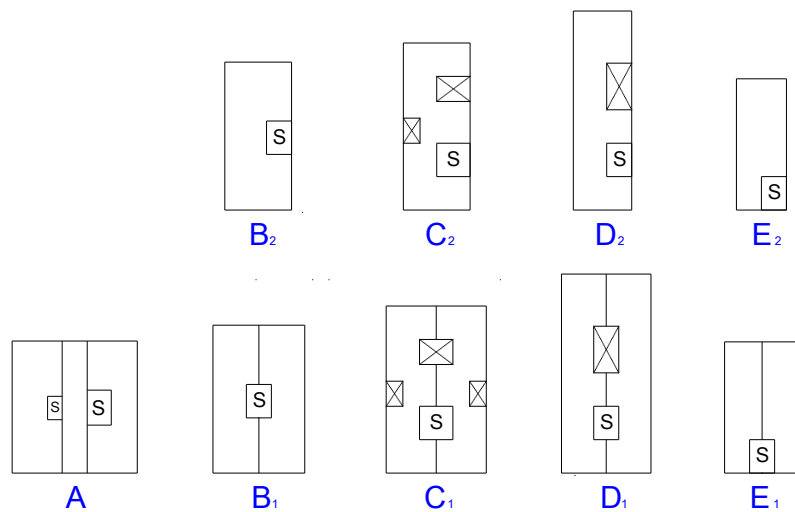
Plan sketch of residential listed building types at the *Eixample
